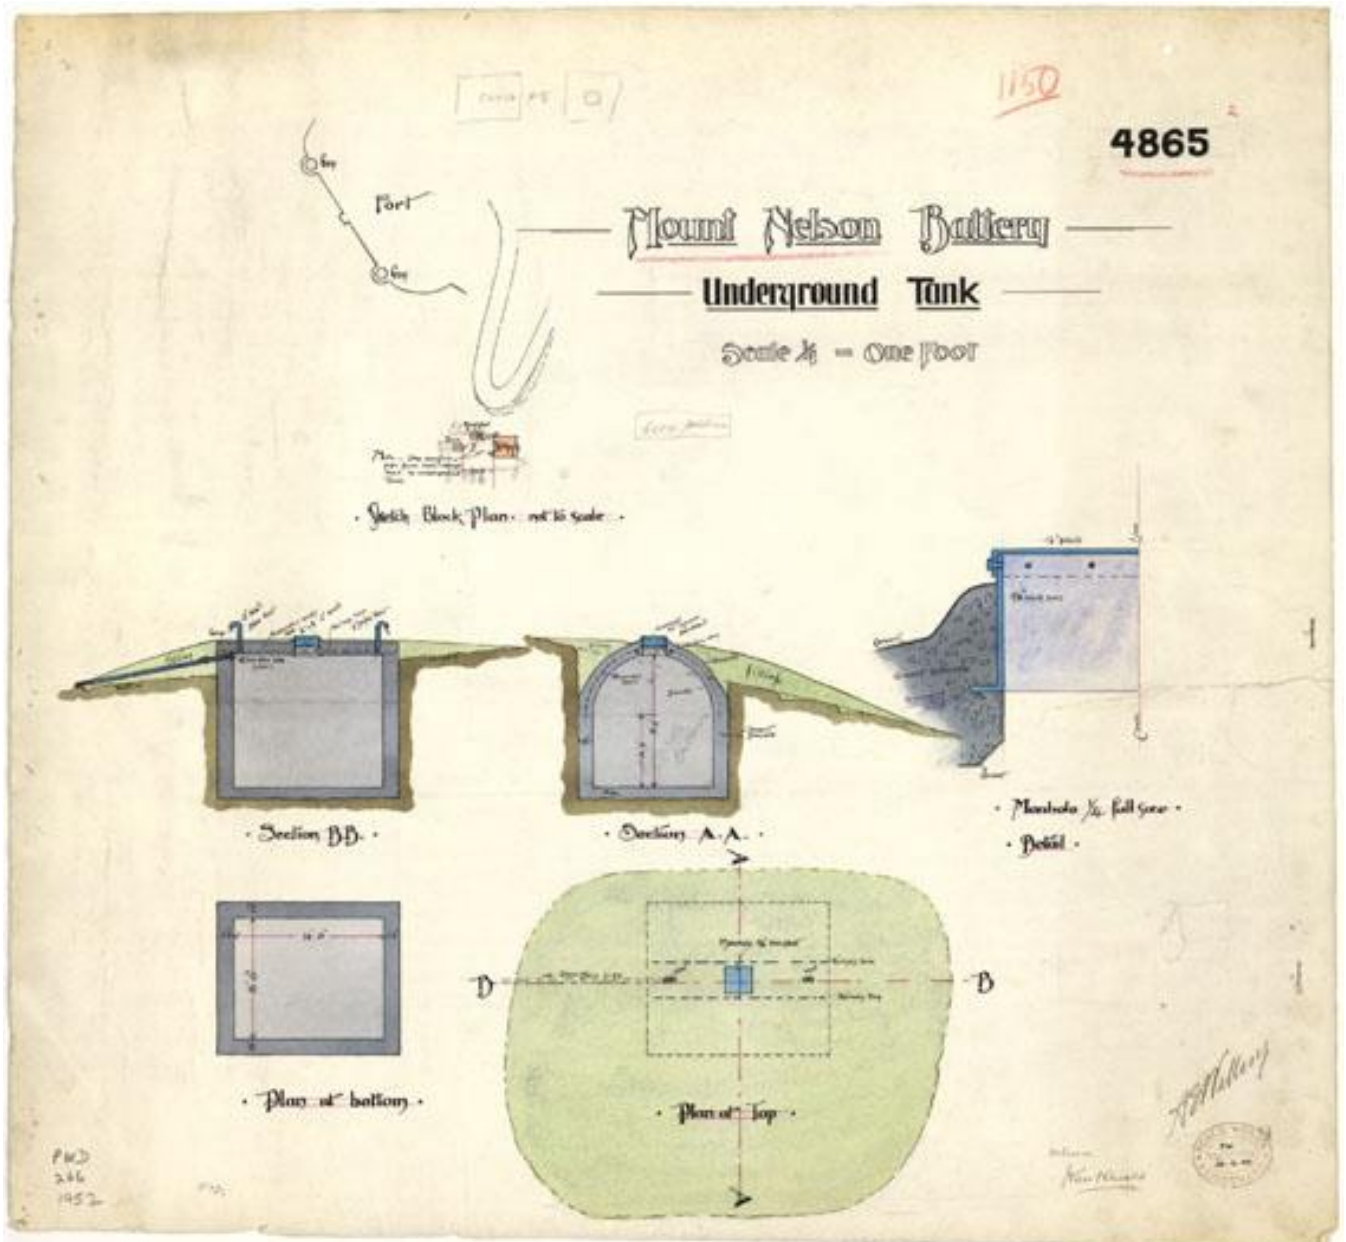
(1909) Architectural drawing - Mount Nelson Battery, Hobart, Tasmania -underground tank with block plan, top and bottom plans and sections (National Archives of Australia, PWD266/1952).
